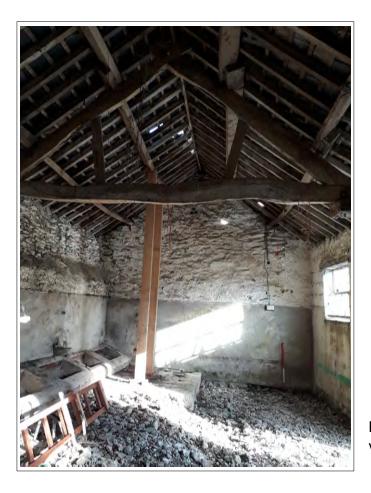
Barn interior with roof truss, view north-east. 1m scale
